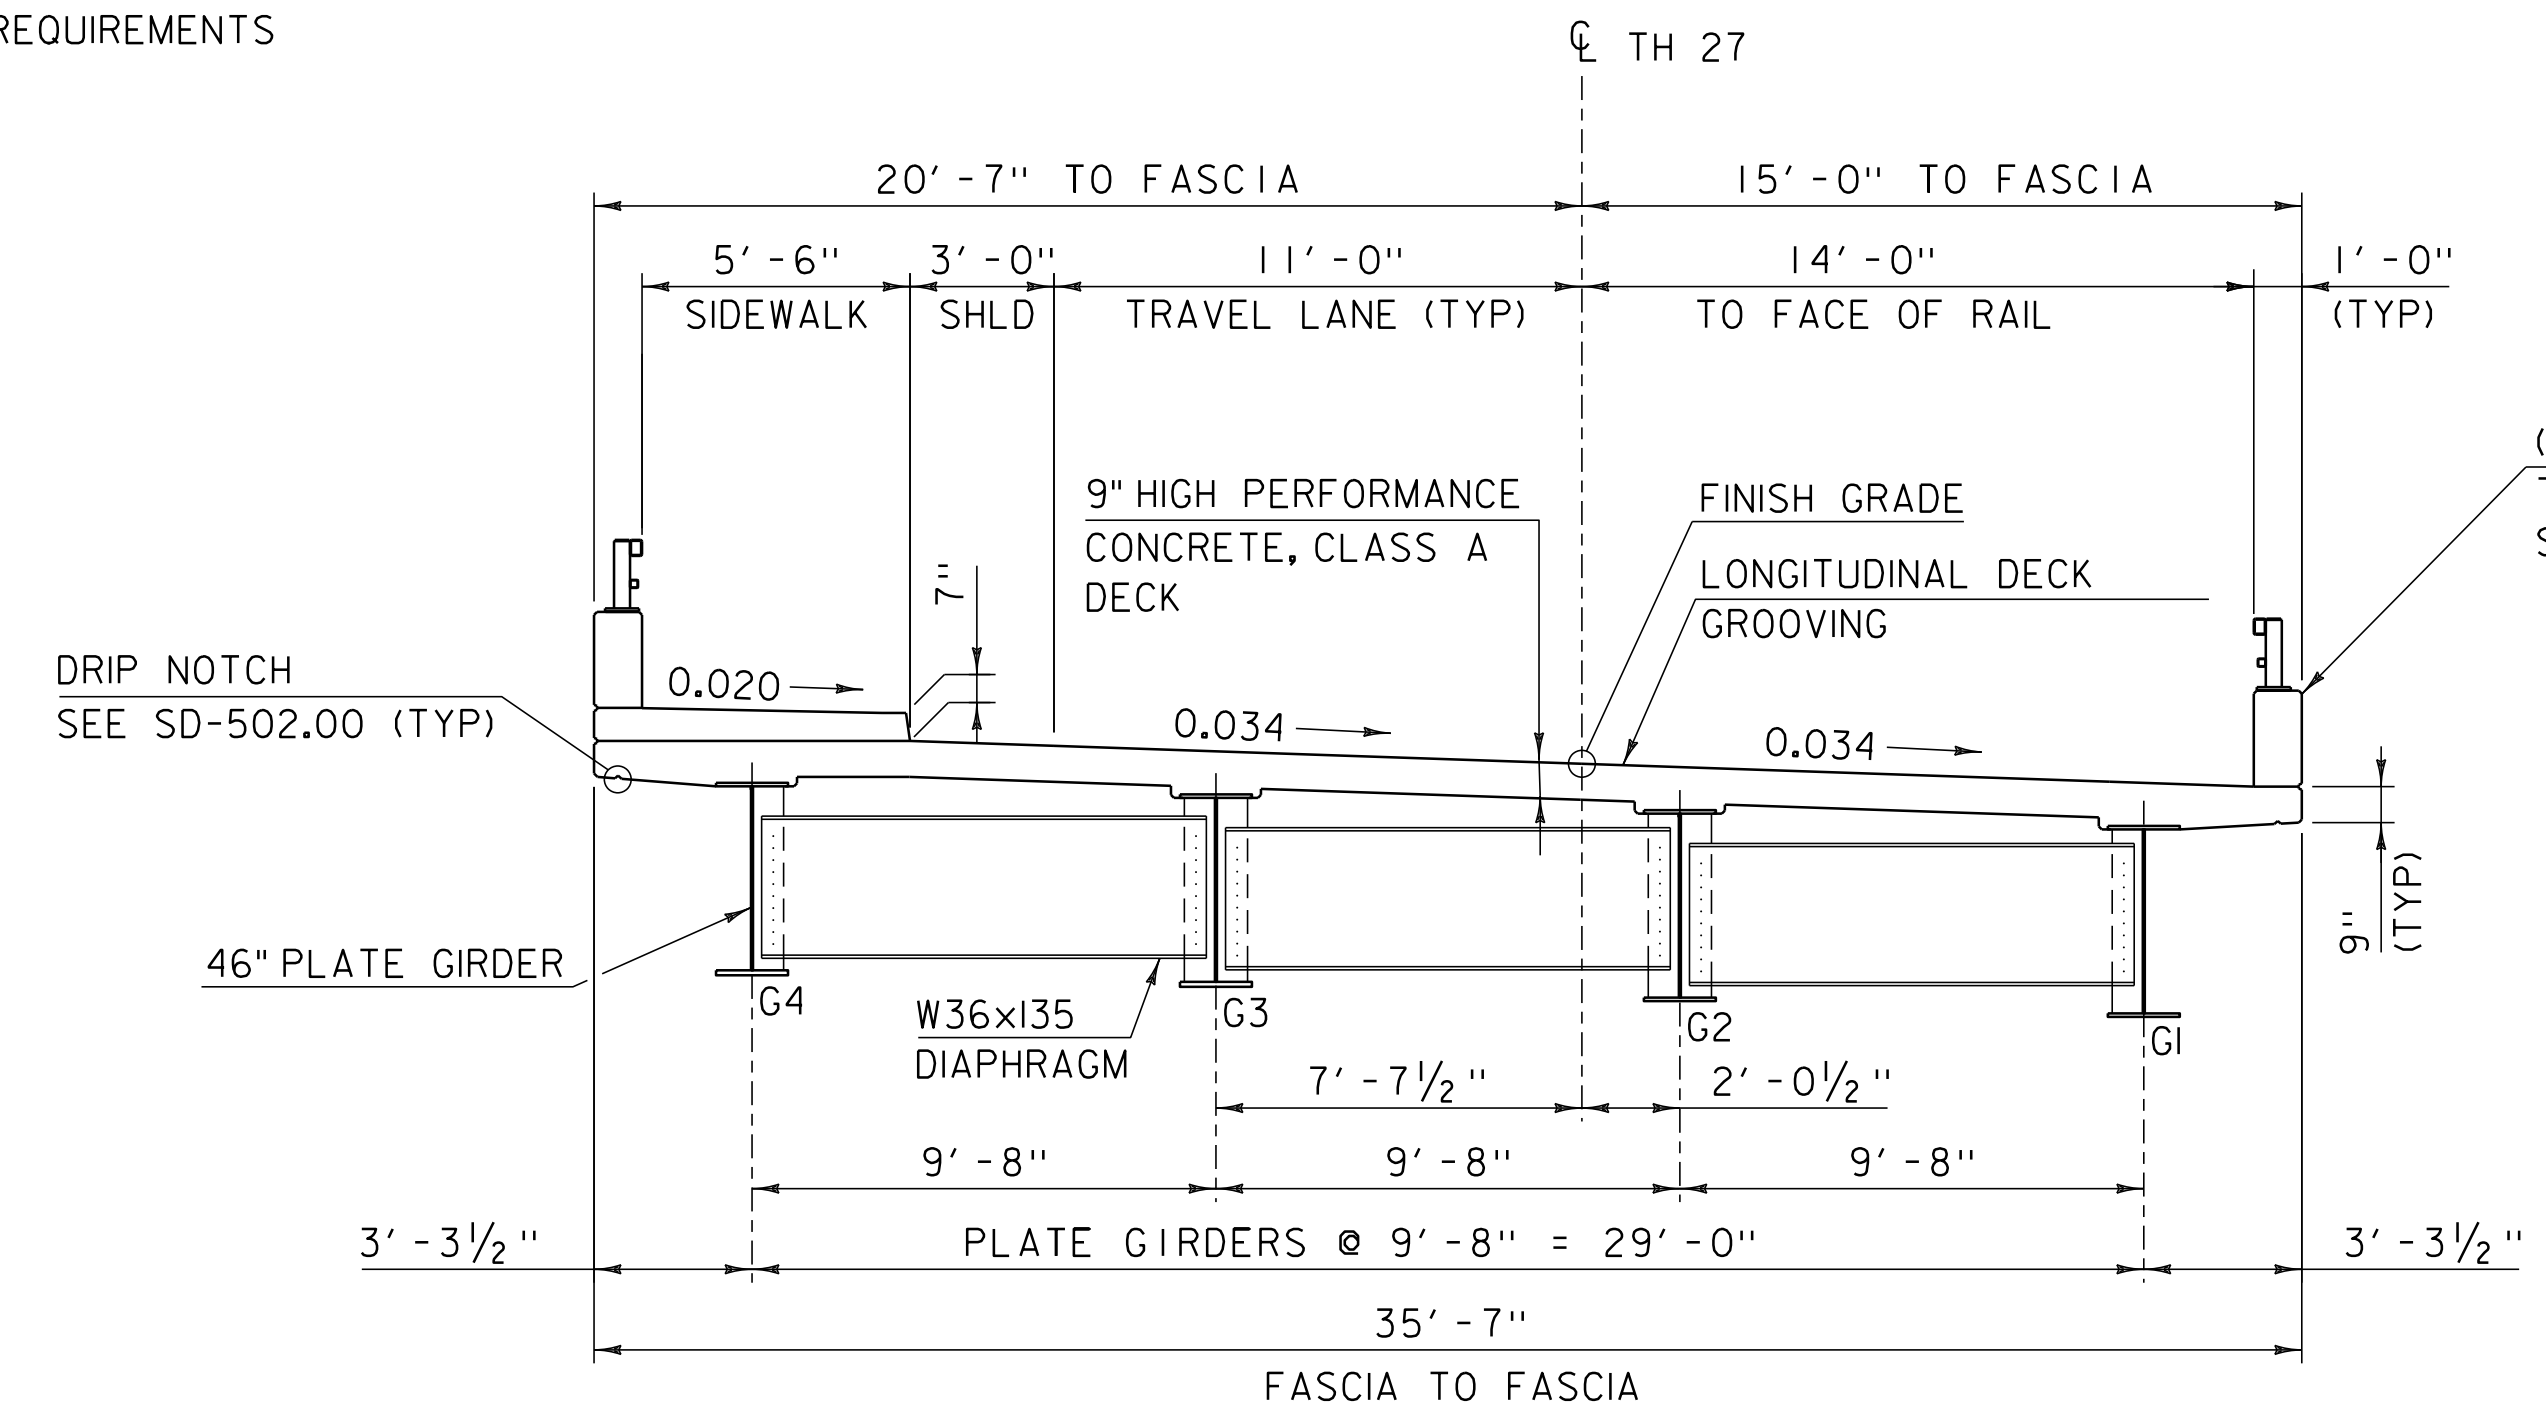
DETAIL OF TYPICAL WITHOUT GUARDRAIL
